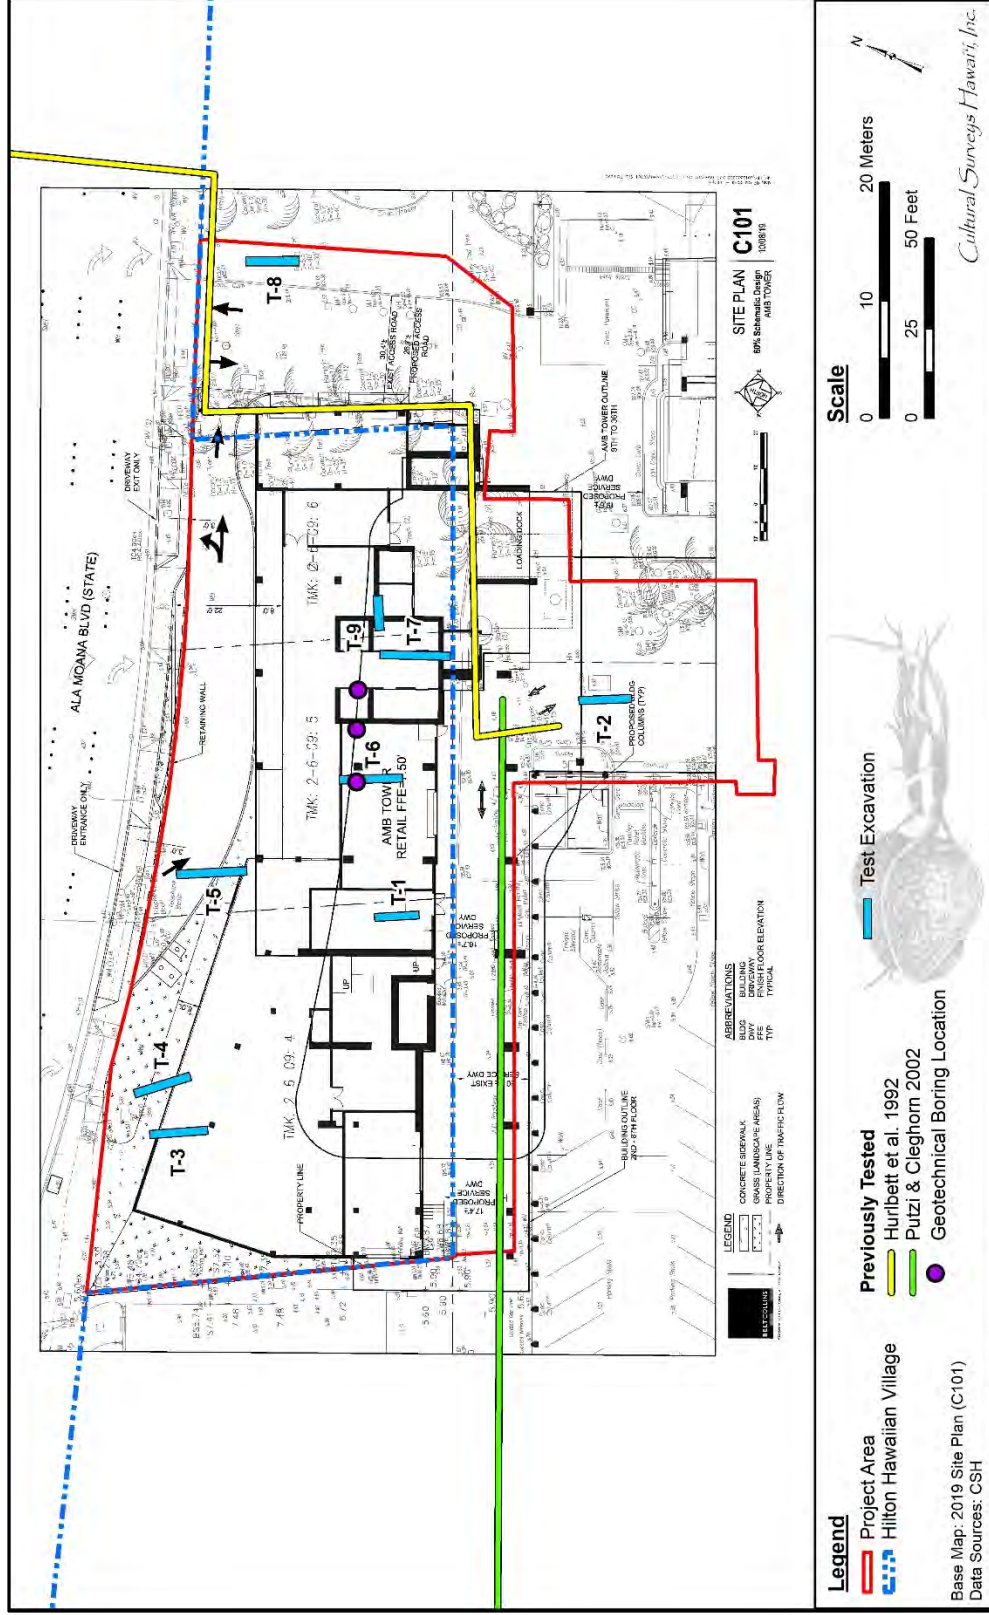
2019 Site Plan (C101) supplied by G70 with overlay of AIS test excavations T-1 through T-9 (blue rectangles), three geotechnical borings conducted in 2017 (purple circles), and excavations previously documented under archaeological monitoring by Hurlbett et al. (1992) and Putzi and Cleghorn (2002) (yellow and green lines, respectively)
